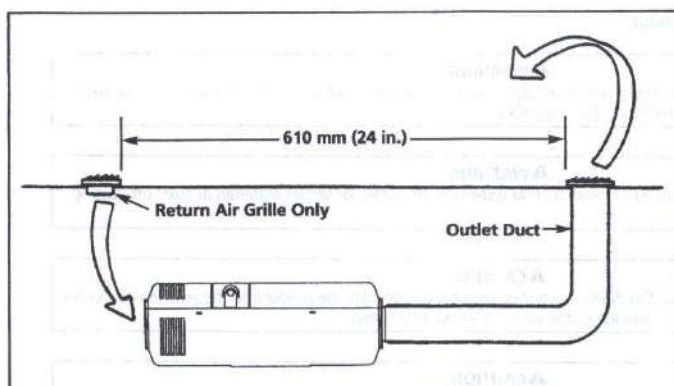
Heater Ducting Method A - Return Air Grille Only
